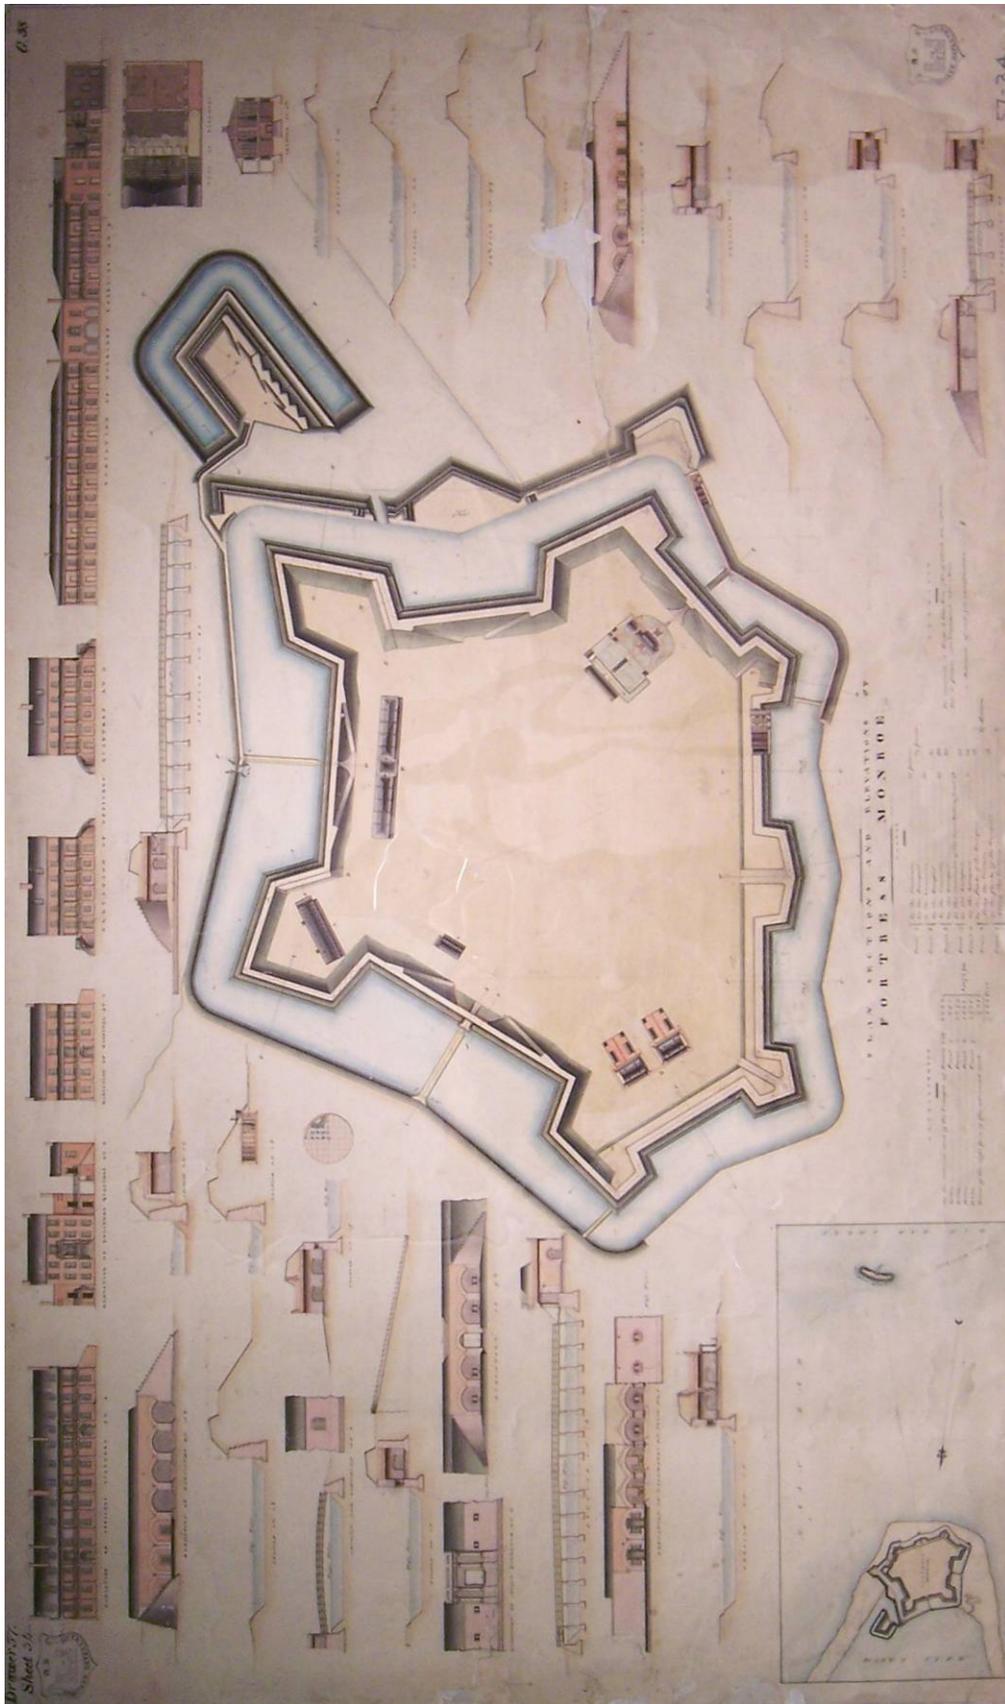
Plan of Fortress Monroe, Virginia, 1826 (NARA College Park, RG 77 DR.57 sheet 34).
